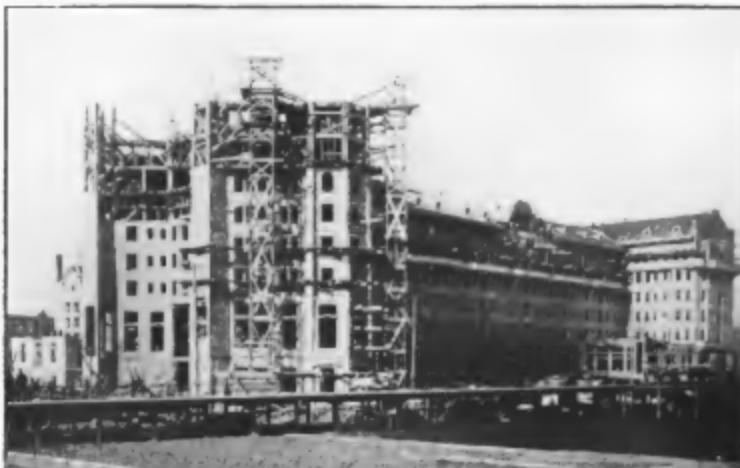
MARLBOROUGH BELSENHEIM HOTEL, ATLANTIC CITY, U.S.A., IN COURSE OF CONSTRUCTION BY THE TRUSSED CONCRETE STEEL CO., LTD.
